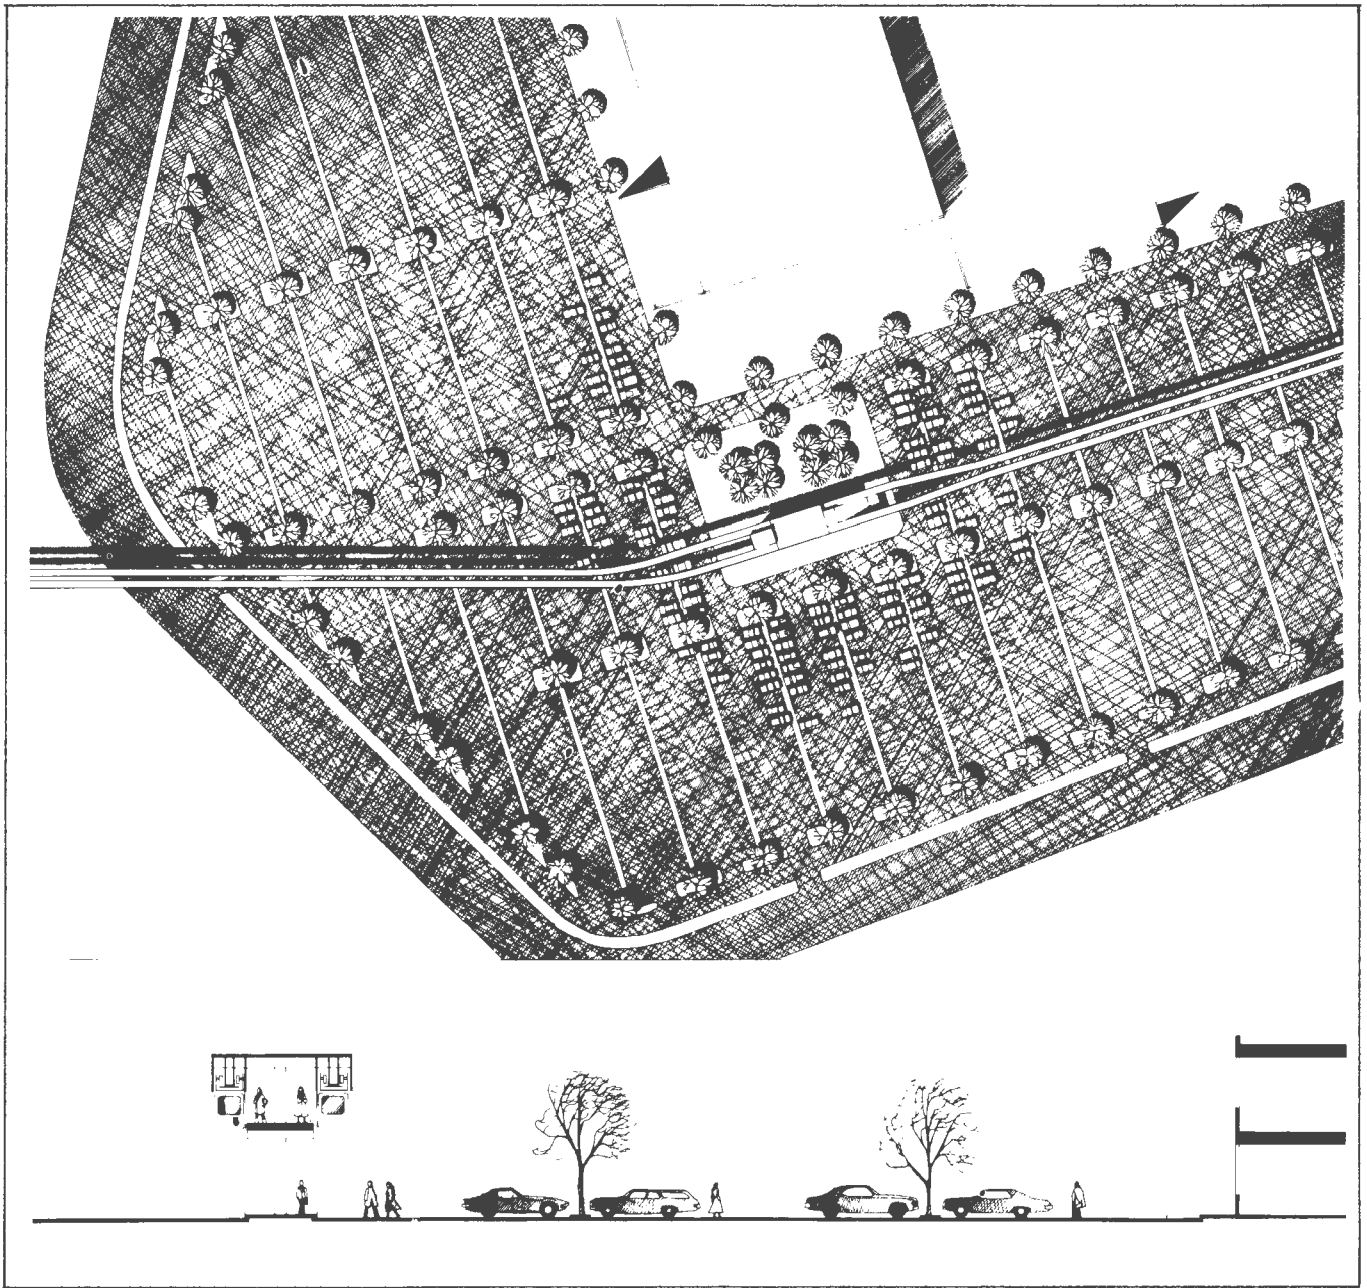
Plan and Section of Suspended AGT Station at Southlake Mall
